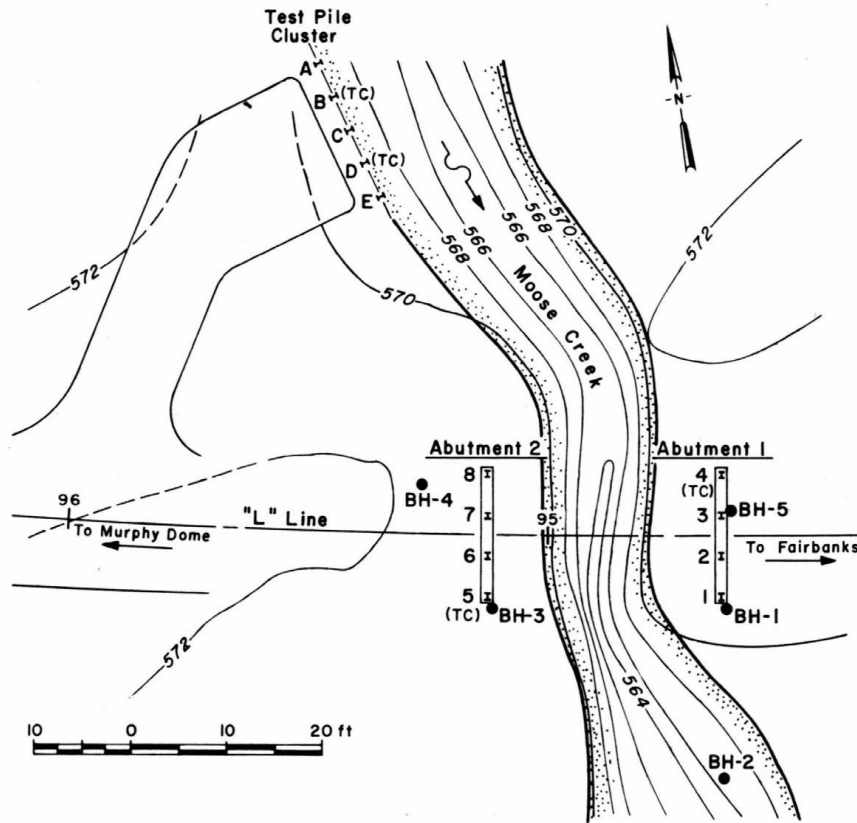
Foundation plan and test pile cluster, Moose Creek. BH-1-4 are test borings. BH-5 is standard penetration test.
